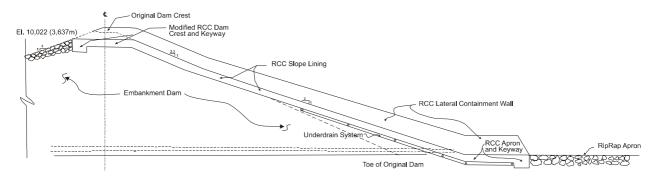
Modifications to downstream slope of the dam. Maximum cross section.
